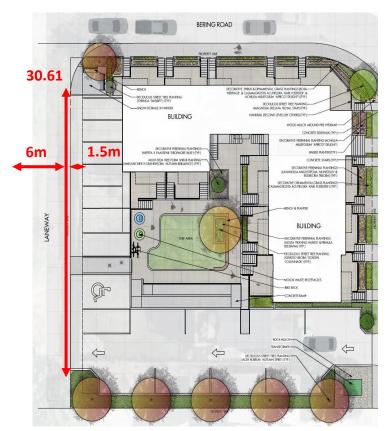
increased driveway width and reduced drive aisle width to facilitate parking adjacent to the rear lane.
